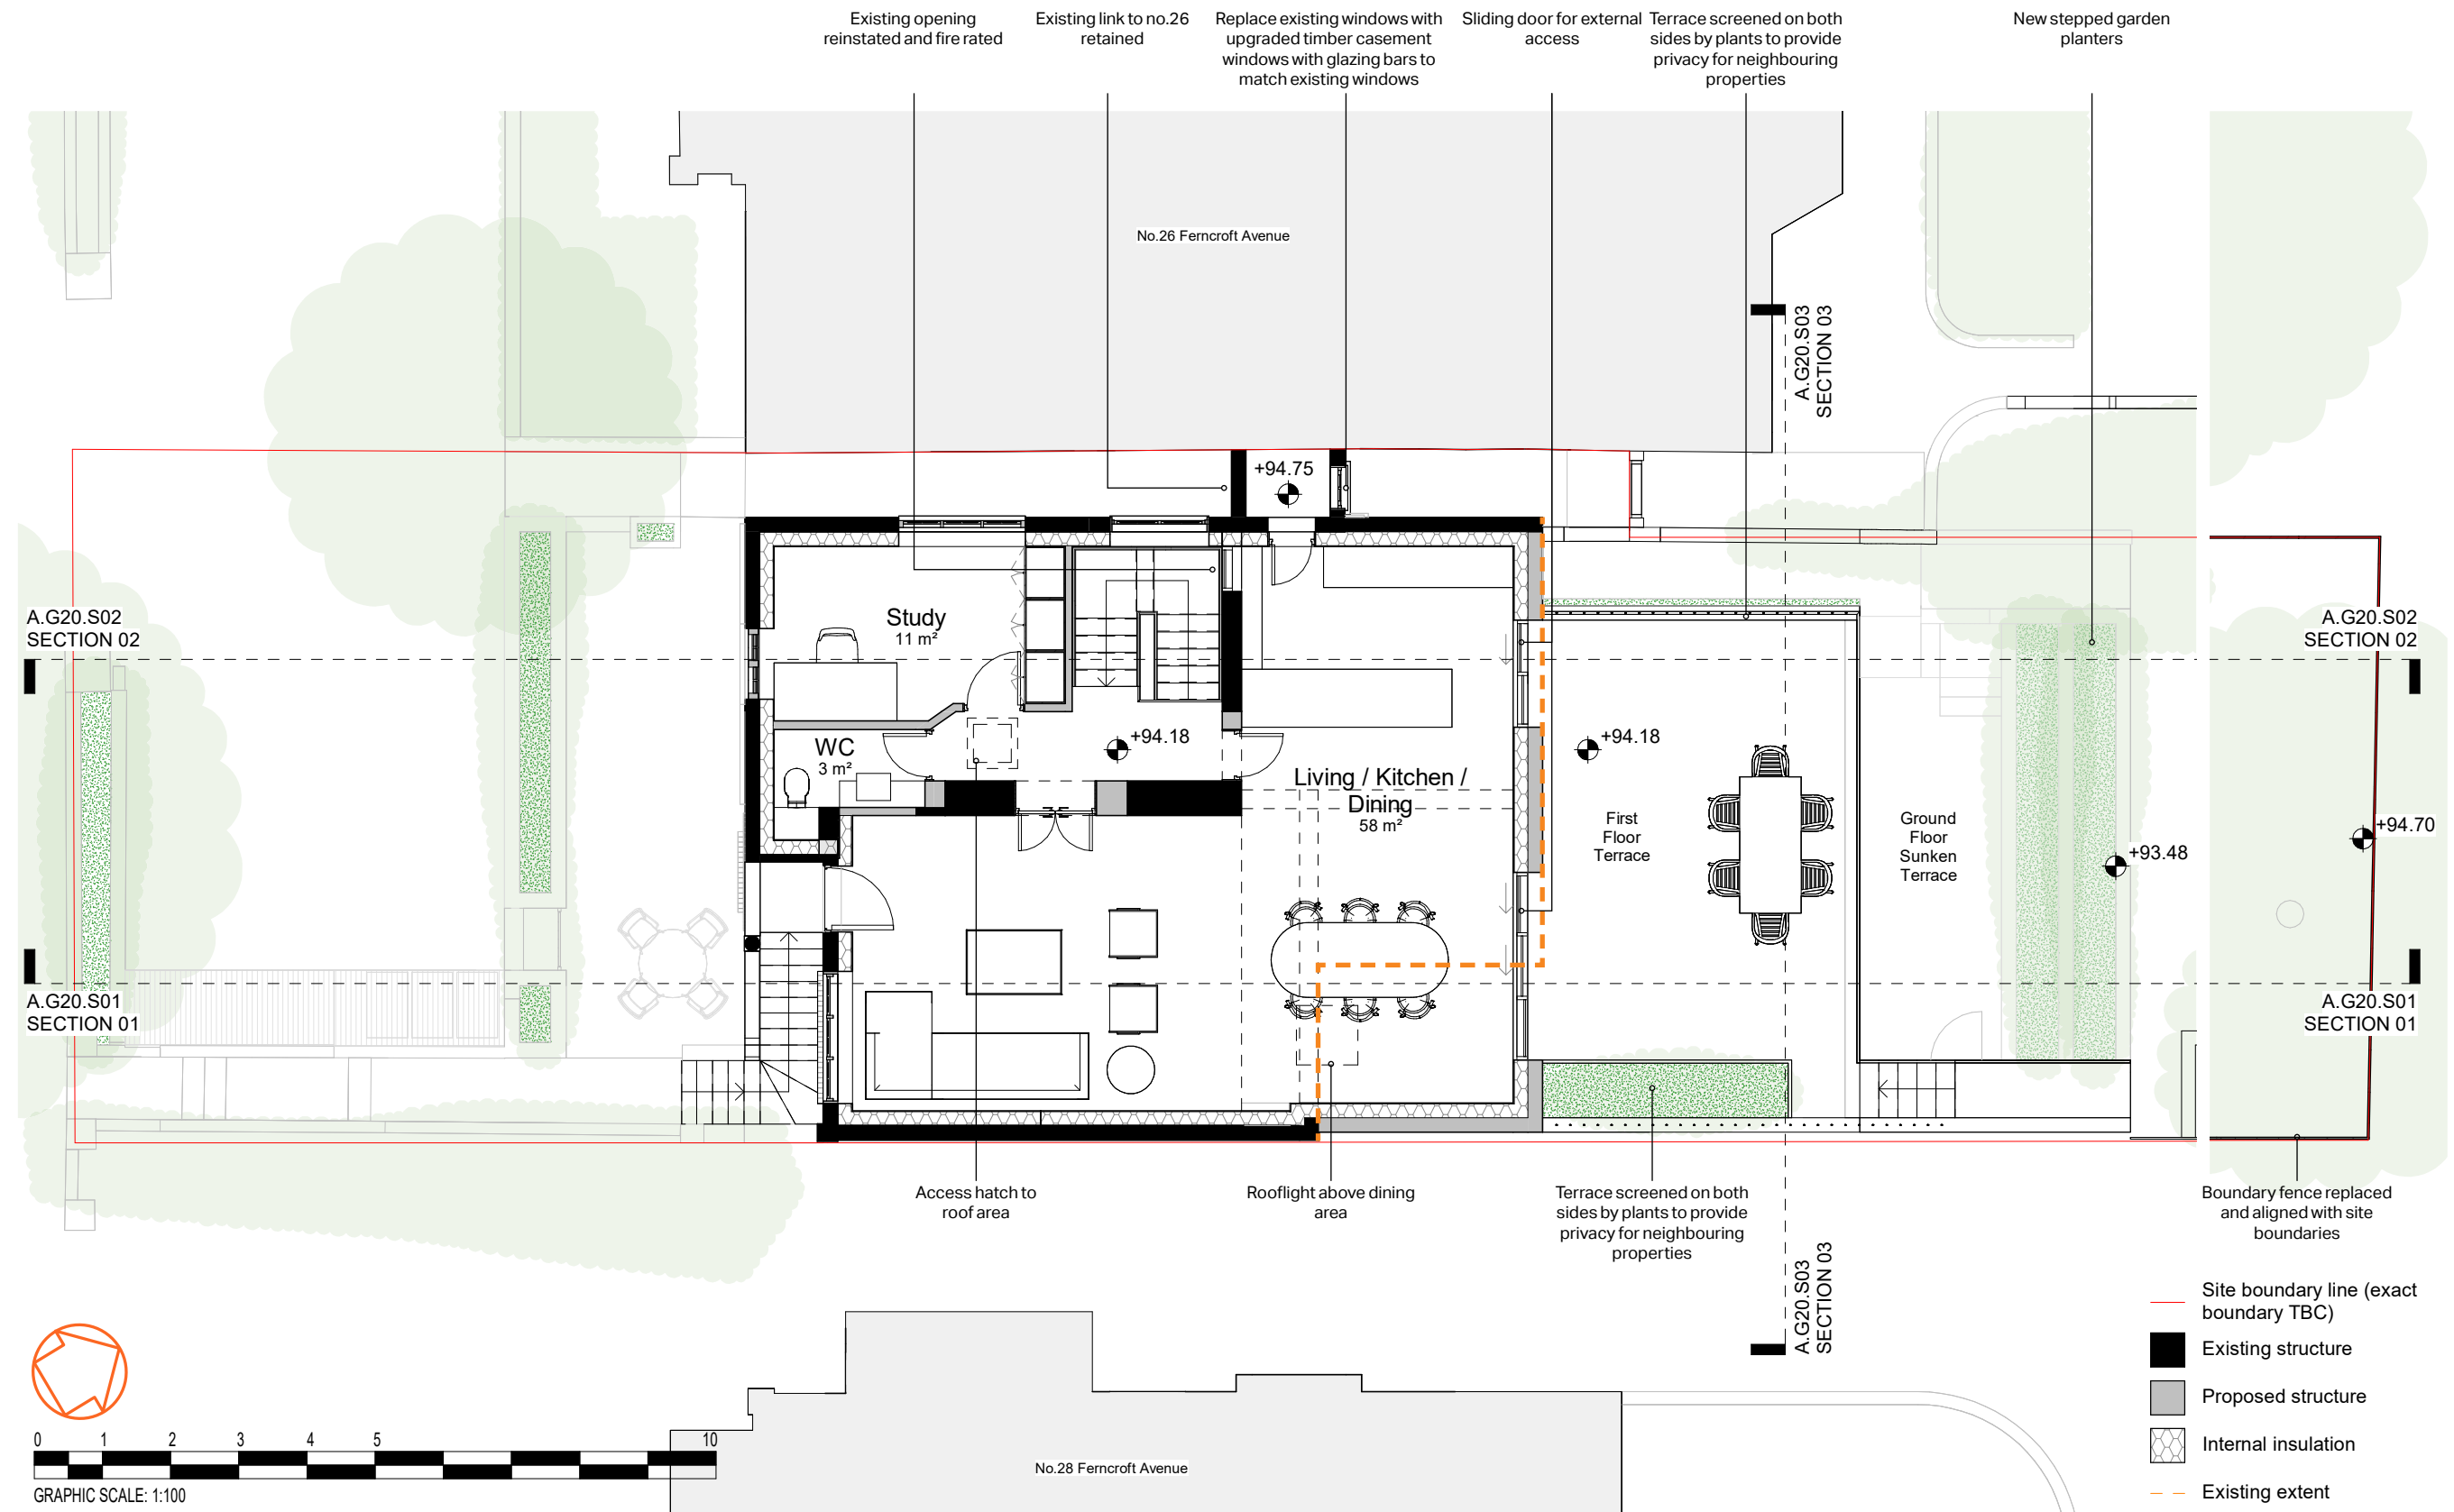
Proposed First Floor Plan 1:100 @ A3
